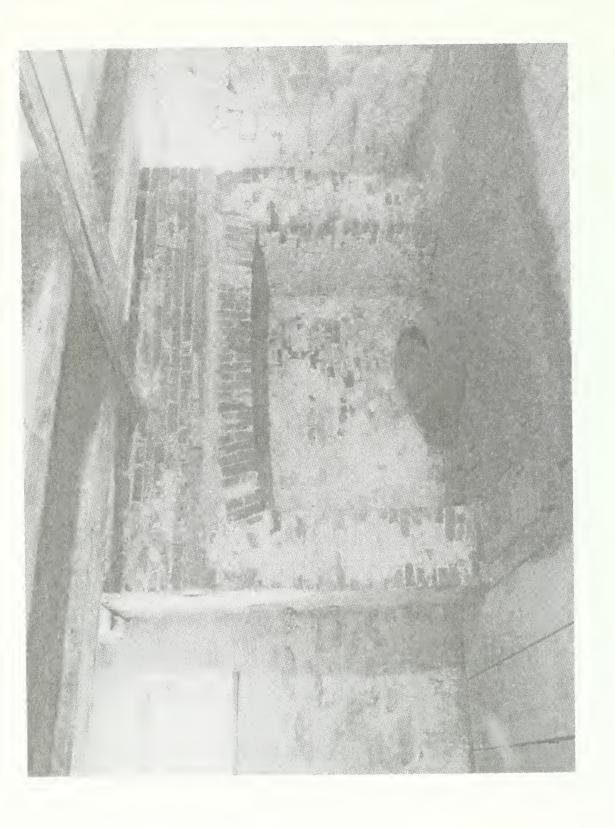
Schuyler House: Cellar kitchen (Room 004), view of fireplace on south foundation wall (1982).
